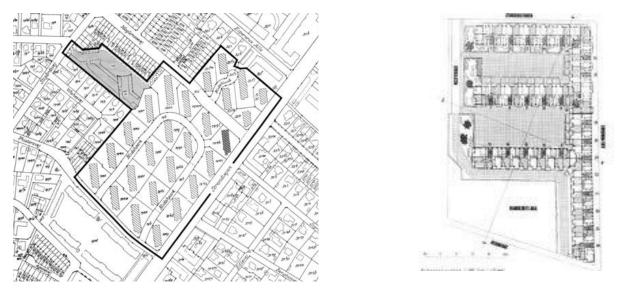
The building layout of Blidah Park (1932-34) with its strictly parallel block orientation (left) and the building layout of Haunstrupgård (1938) with its comb structure for improved wind conditions and better defined outside areas (right)
